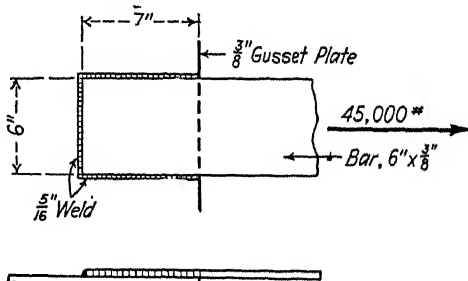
Fillet Welded Connection for Flat Bar.
